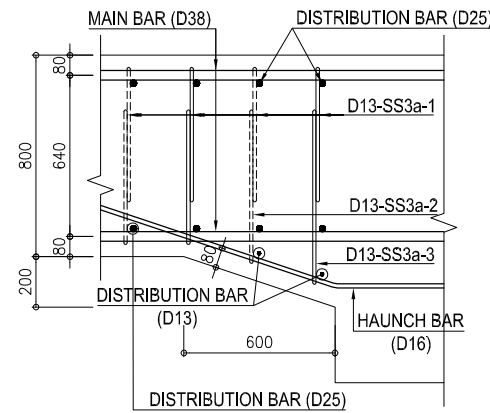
DETAIL OF STIRRUP SS3 (L1B AXIS LEFT SIDE)
